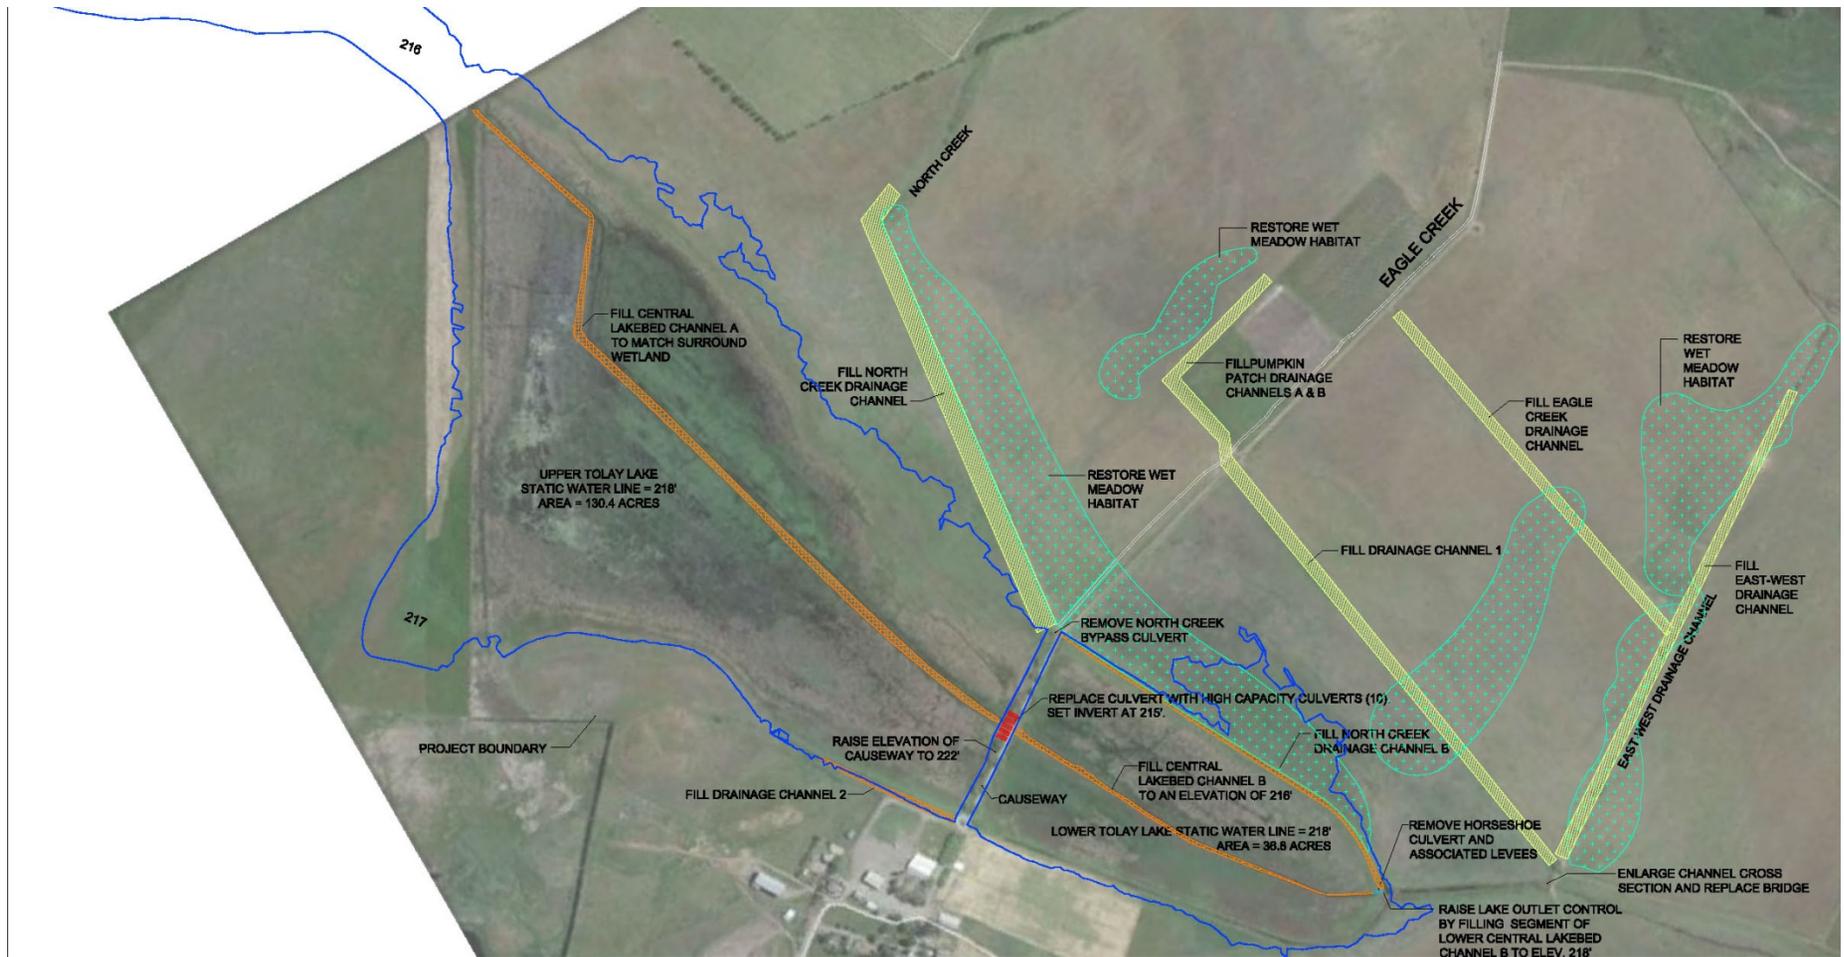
Conceptual design for lake restoration Alternative 2 – Lake Outlet Elevation at 218" without a Back-berm.
